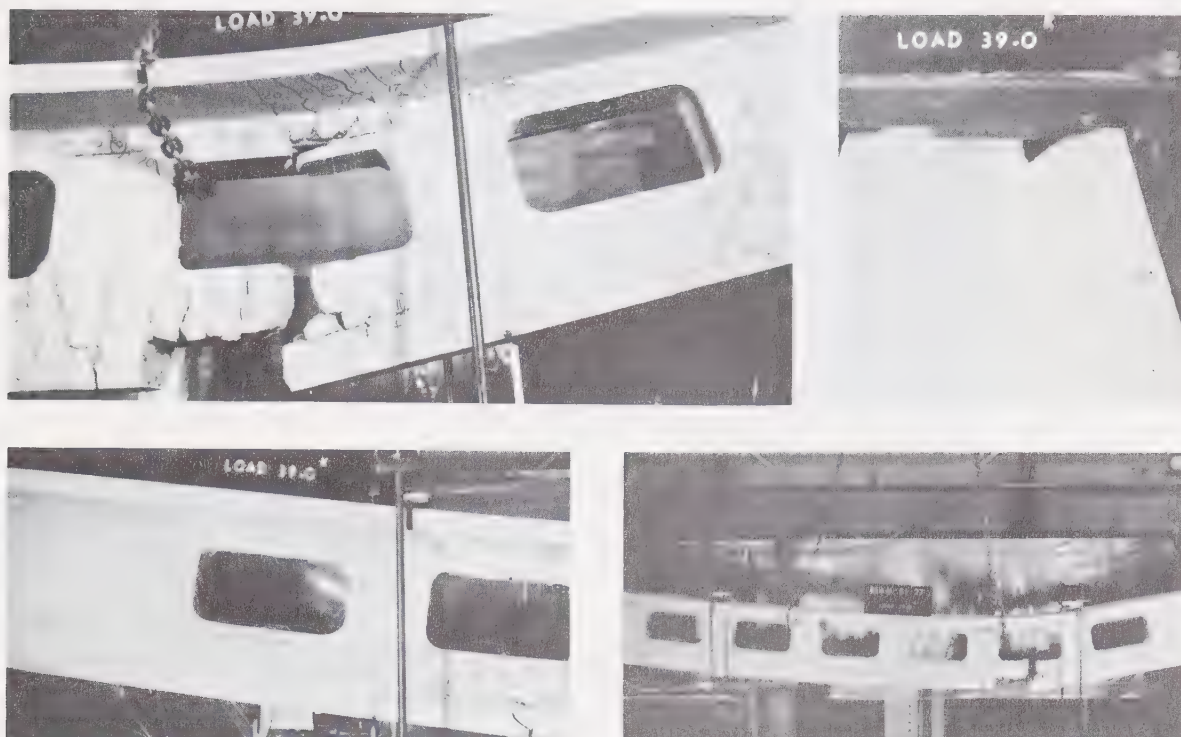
CRACKING AND FAILURE PATTERN OF BEAM 27-16-4
